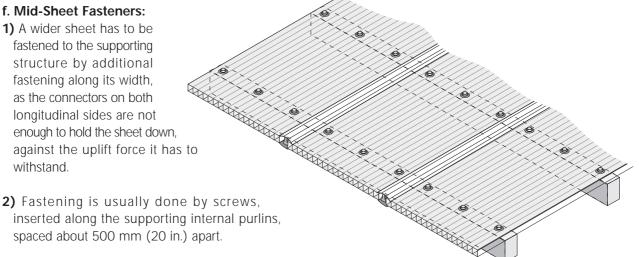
Schematic Isometric View of Partial Roof Installation with Mid-sheet Fasteners
